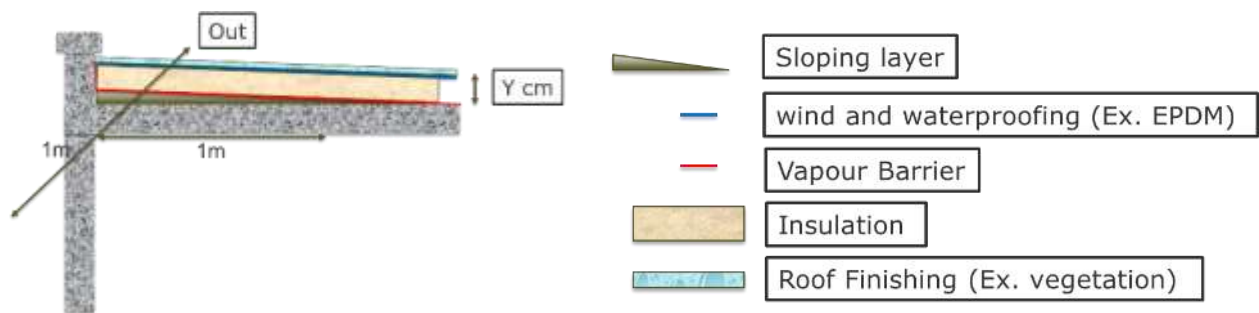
Cross section of non-accessible flat roof (conventional roof)
